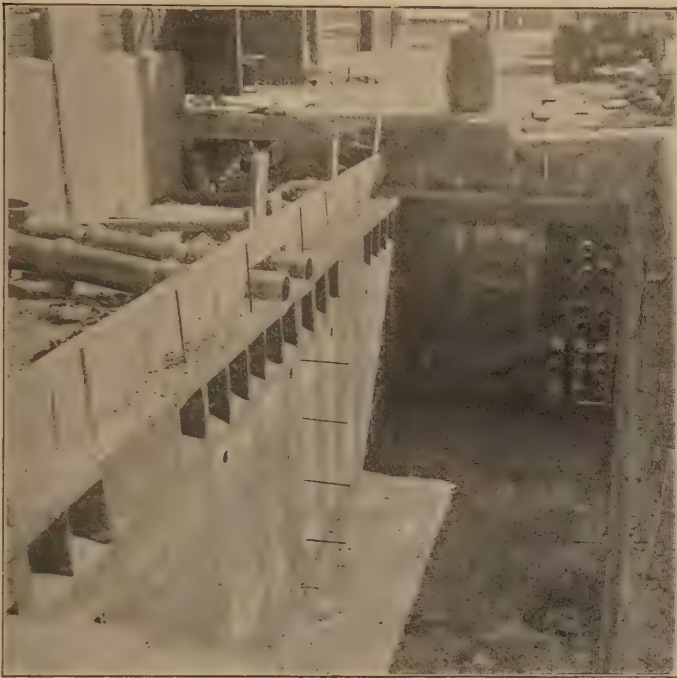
Distribution manhole under construction. Ducts project out into the manhole and continue along the wall incased in concrete. Stepping off the various ducts to correspond with the duct selected to leave the substations for cable going to a specified location.
